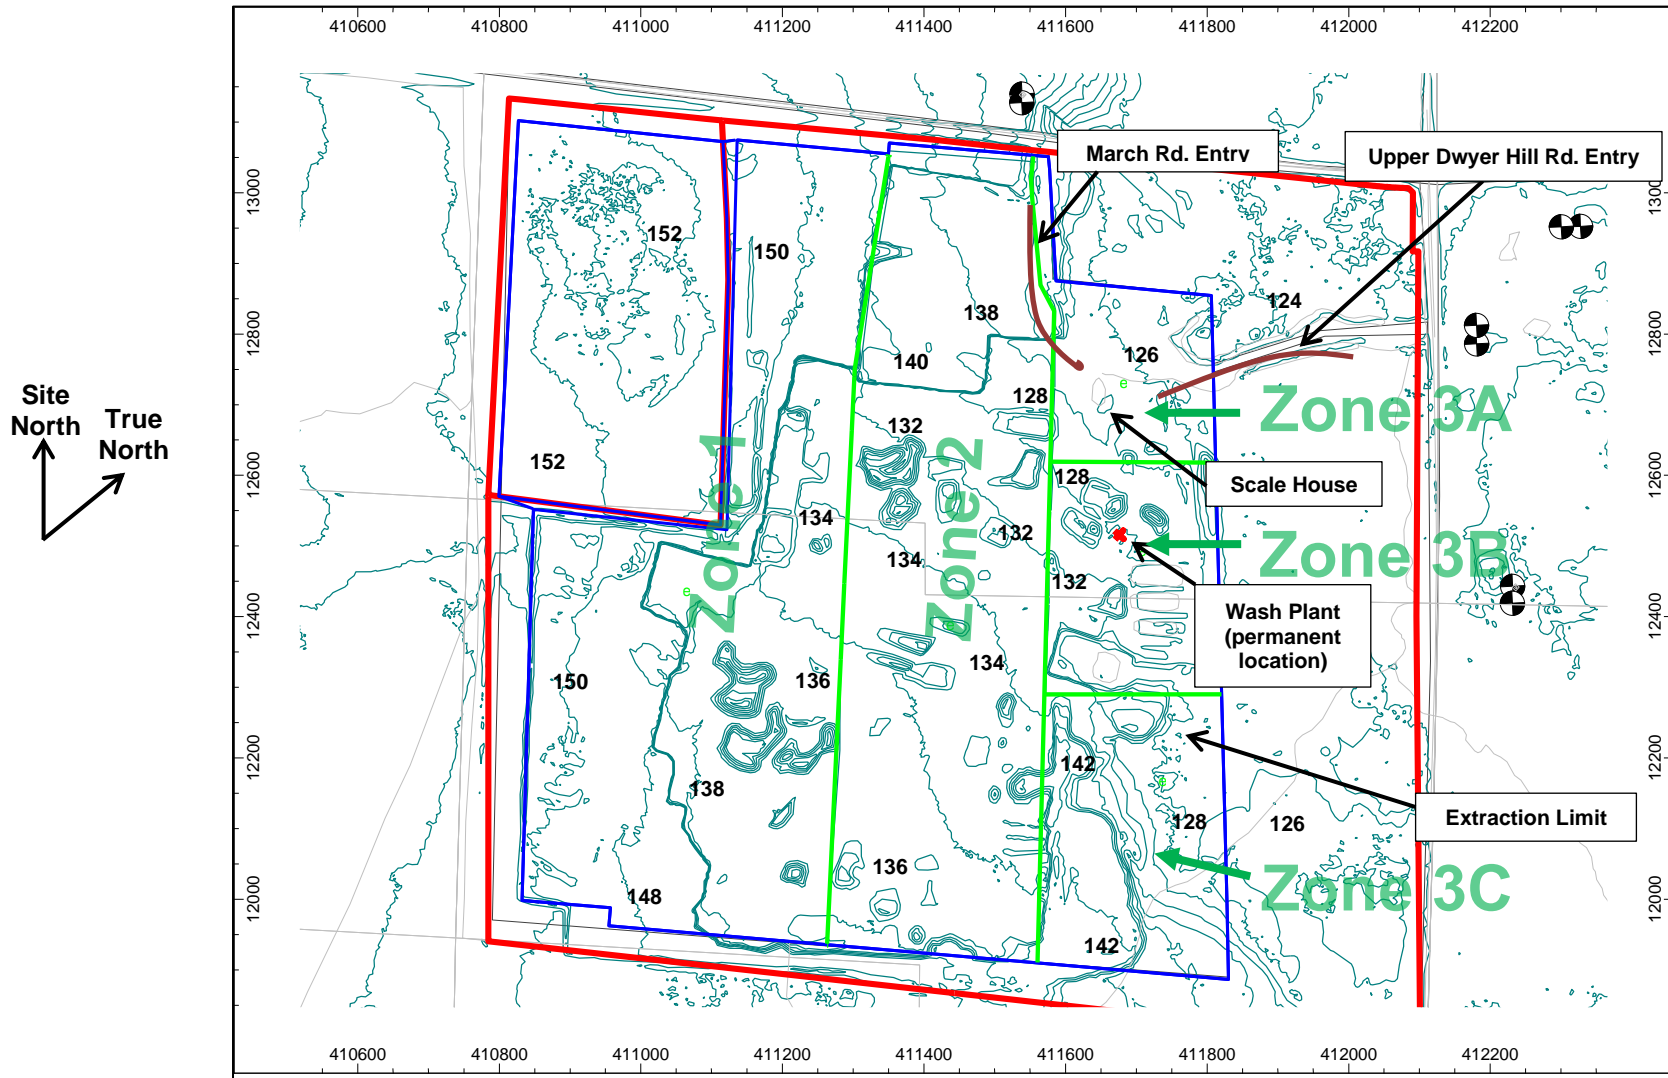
Site Details, Extraction Zones & Spot Elevations (masl) (elevation contours at 2 m intervals)
